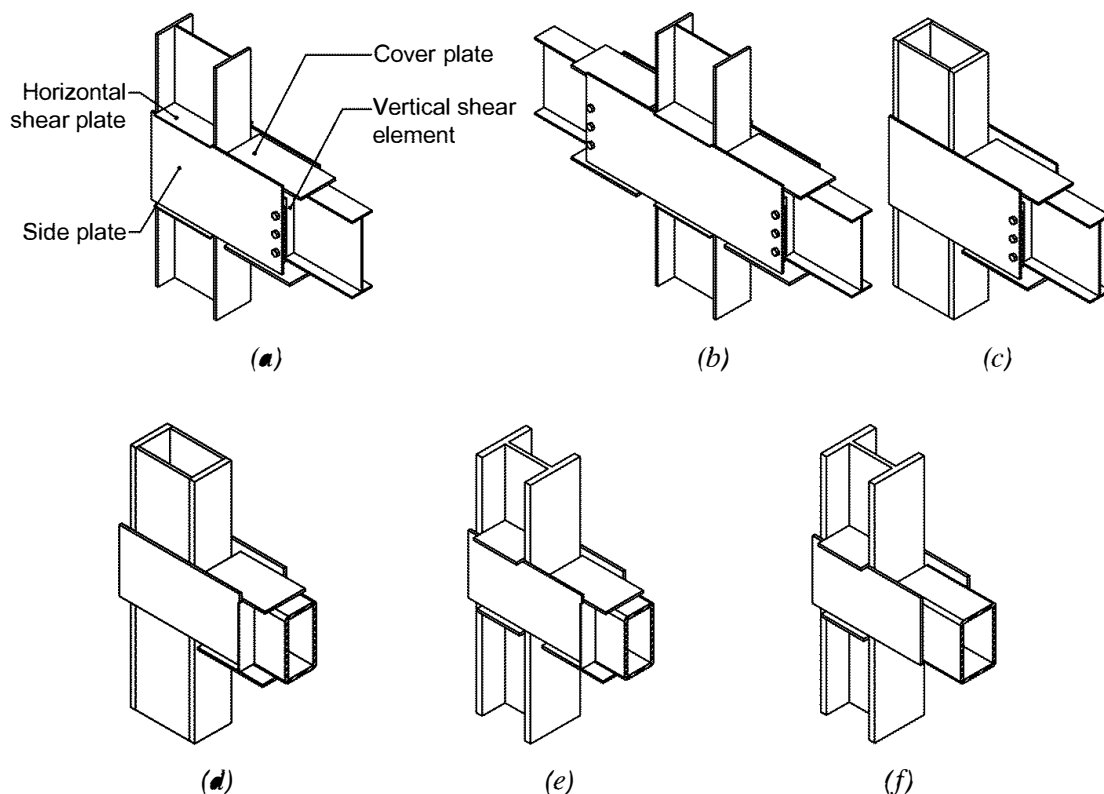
Assembled SidePlate uniaxial configurations: (a) one-sided wide flange beam and column construction; (b) two-sided wide-flange beam and column construction; (c) wide-flange beam to built-up box column; (d) HSS beam without cover plates to wide-flange column; (e) HSS beam with cover plates to wide-flange column; and (f) HSS beam with cover plates to built-up box column.
